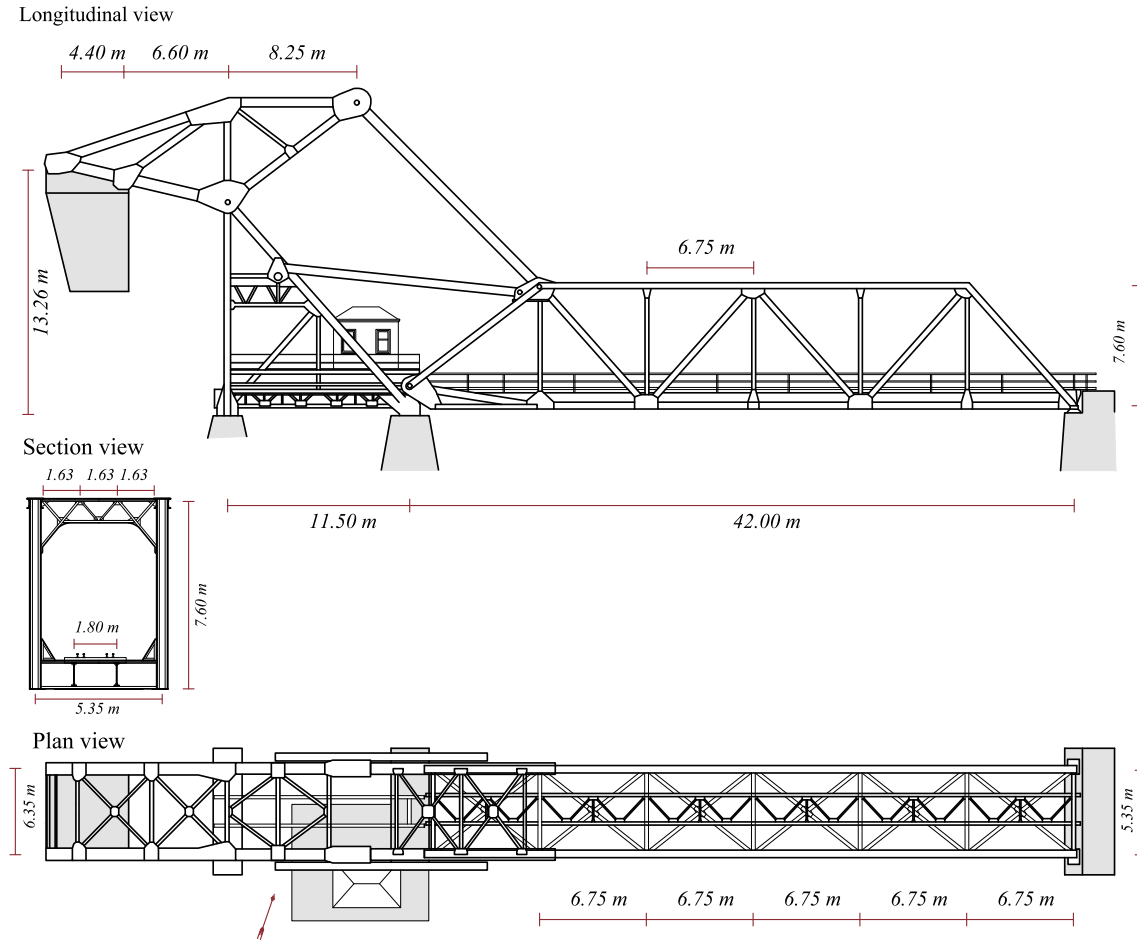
Vänersborg bridge geometry, plan view and longitudinal view.
